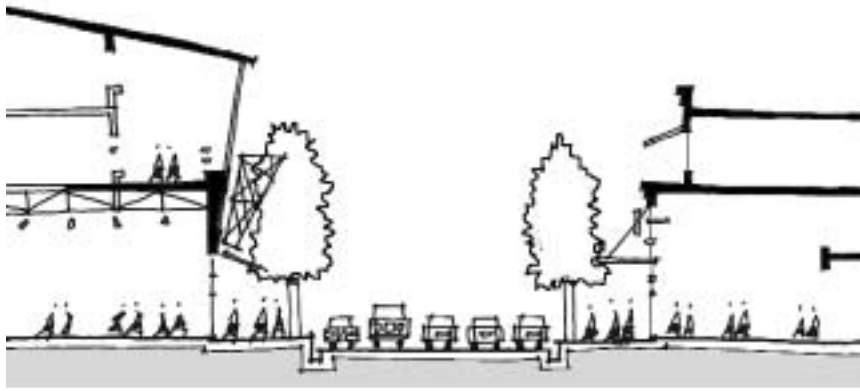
Section: 80' Right of Way. 1 travel lane, 1 parking lane each way
